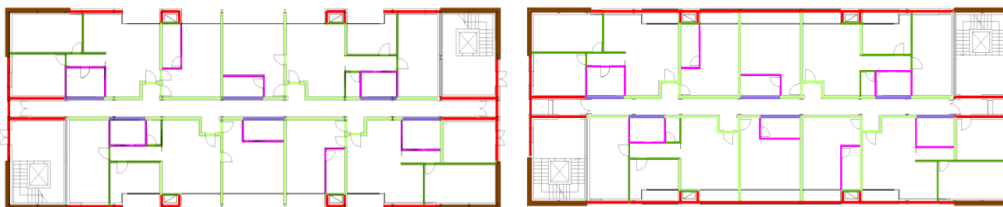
Building's floorplan; ground floor (left), first floor (right).
